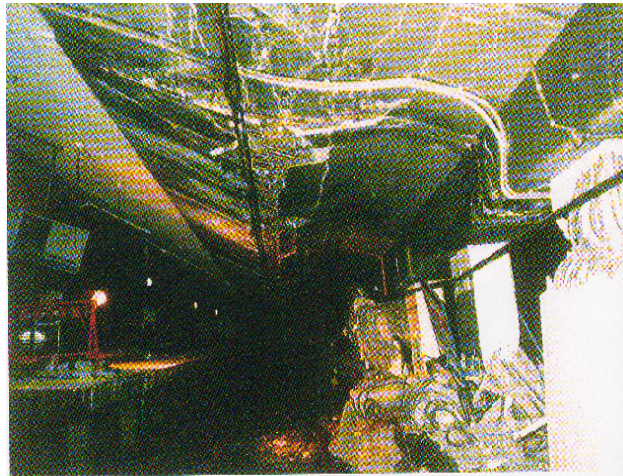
Collapse of ceiling slab and center column of Daikai Subway Station
